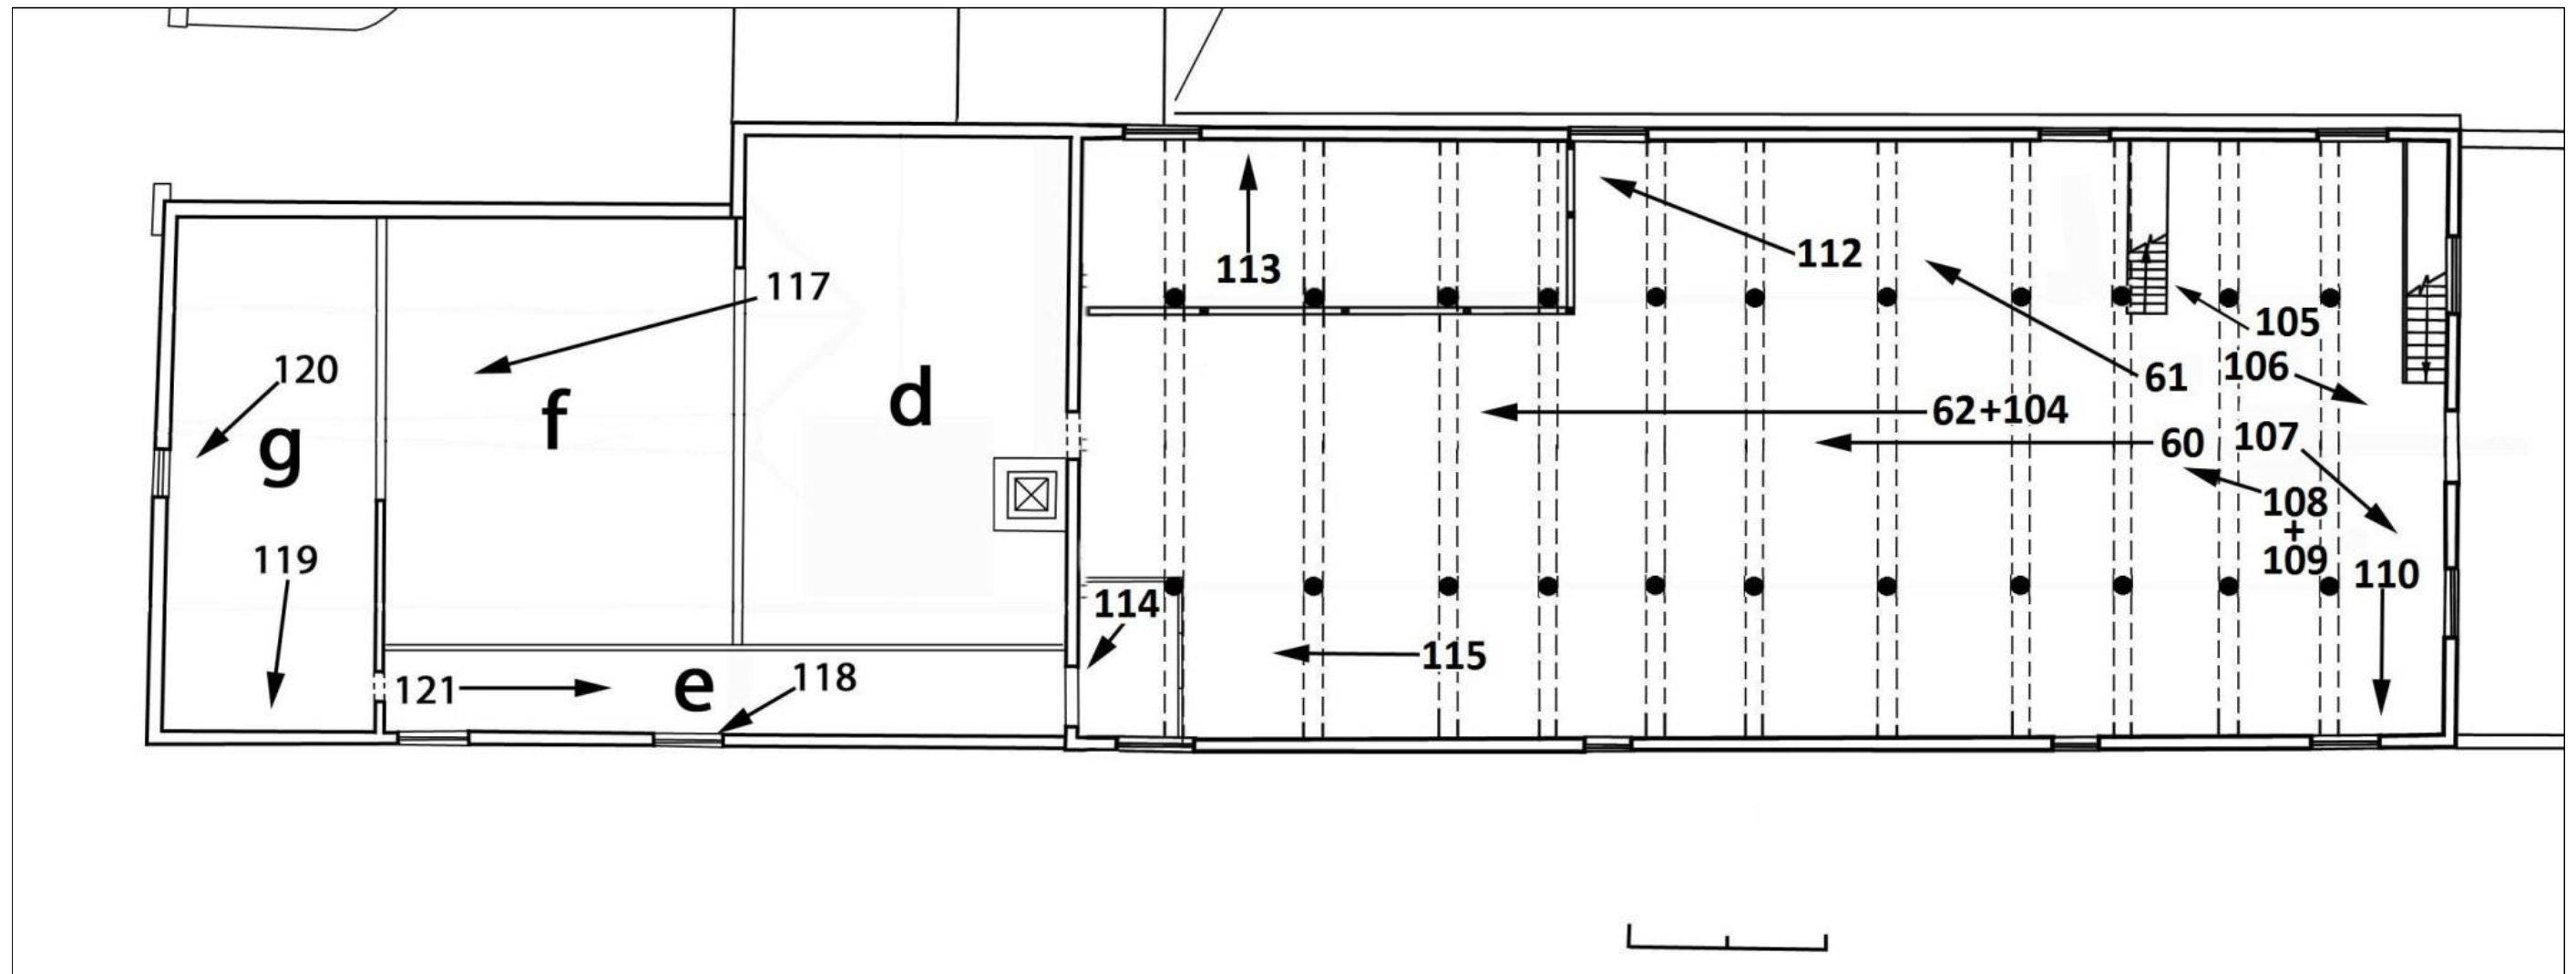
Photographic viewpoints on the second floor of Building 'GF3'.
